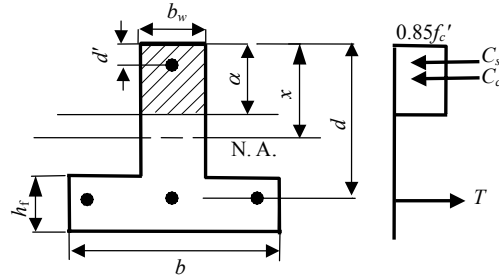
Compression distribution of L-shaped beams without GFRP sheets
